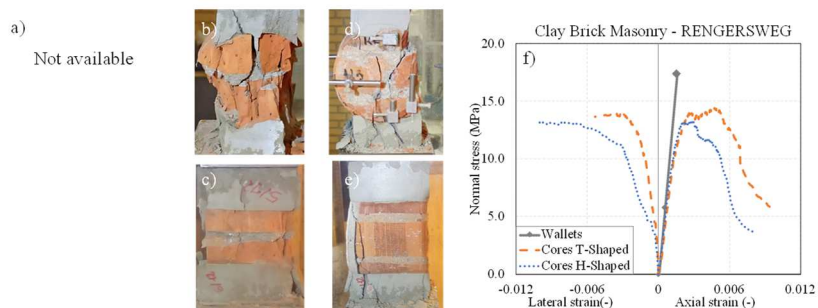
Laboratory-made clay brick masonry (MAT-3): (a) final crack pattern of wallets; (b,c) final crack pattern of T-shaped core; (d,e) final crack pattern of H-shaped core; (f) mean stress-strain relationships.
